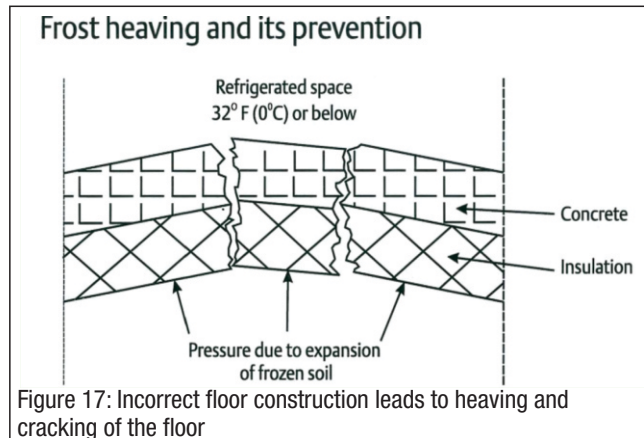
Incorrect floor construction leads to heaving and cracking of the floor
